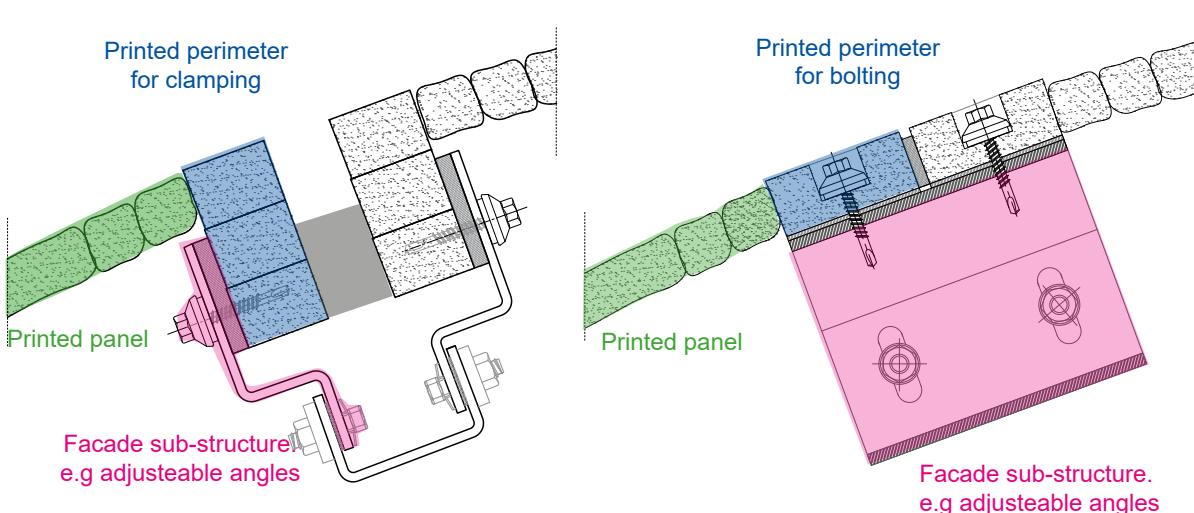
Printing of fully-printed panel - Detailing. [Left: clamped. Right - bolted]
